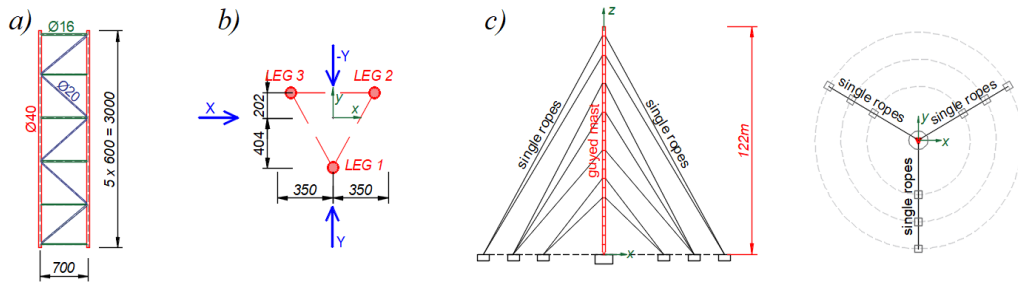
a) Typical mast segment; b) considered wind directions; c) mast layout
